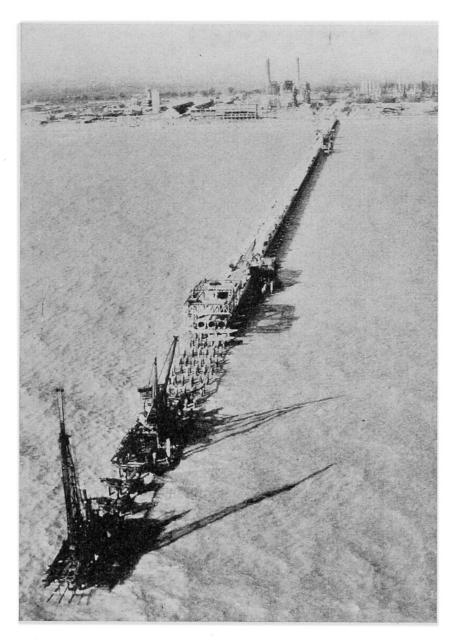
ANIC loading dock at Gela. Driving of prestressed foundation piles.
